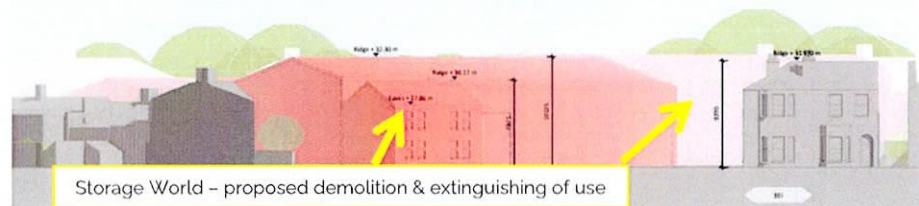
Excerpt from Applicant's proposed demolition elevations (1)
